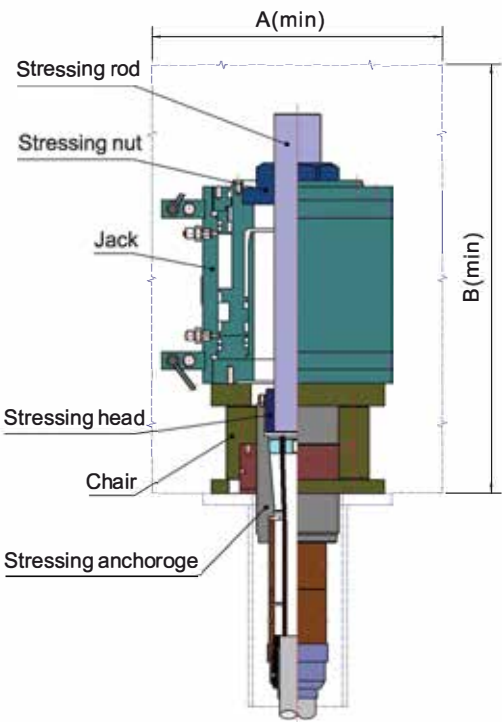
Stressing Schematic Diagram of Hanger Installation
